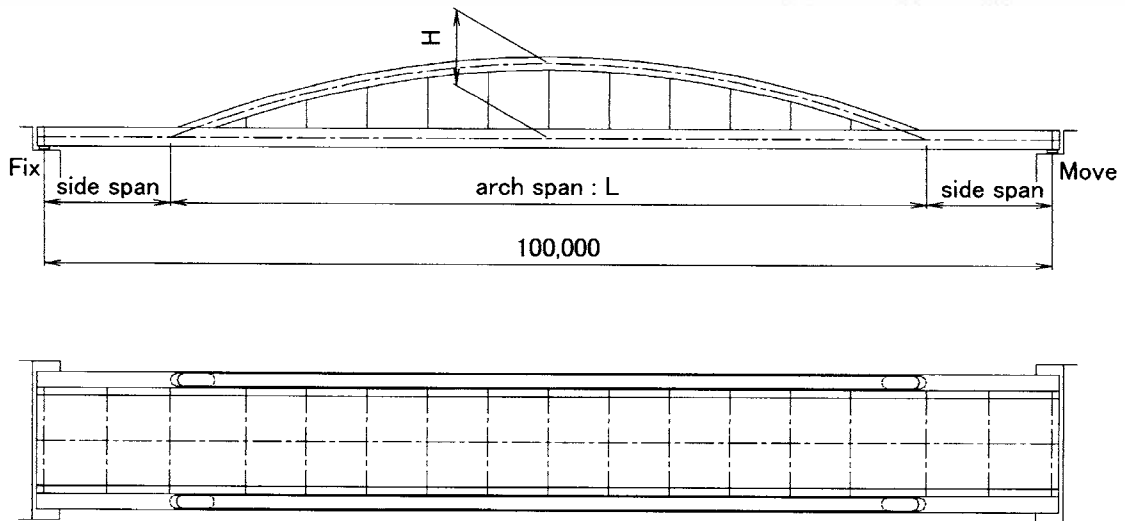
Side and plane of the CFT arch girder bridge (mm)
